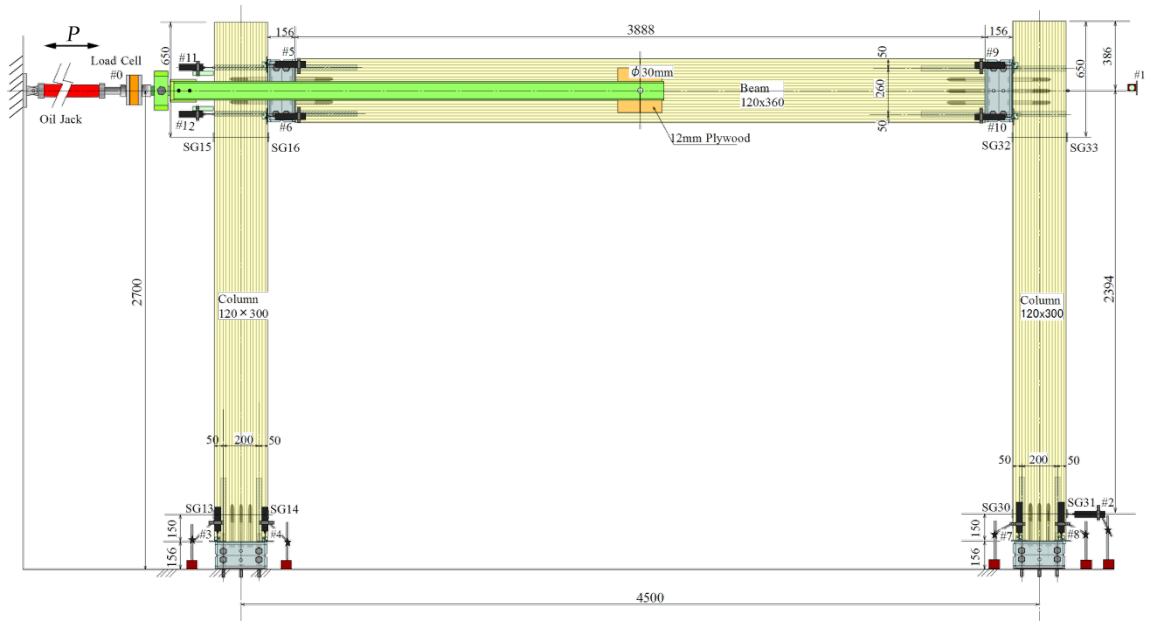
Test set-up for a full-scale glulam portal frame specimen composed of the same LSB joint system as beam-column or column-leg joint specimens.
